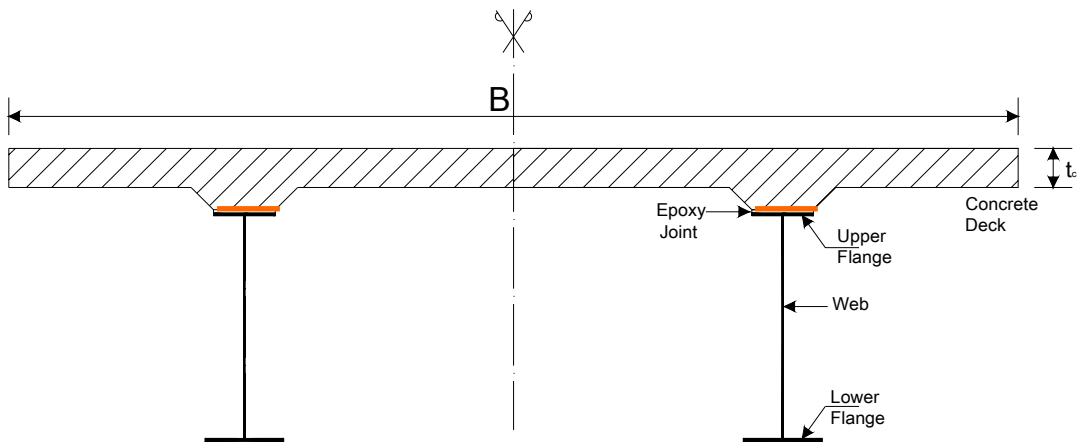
Schematic cross section of a typical bonded composite bridge girder
